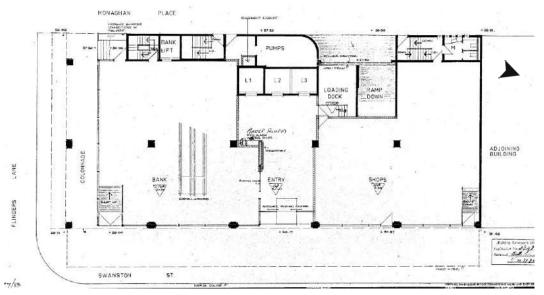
Ground floor plan. Drawing by Buchan, Laird & Buchan, dated April 1971 (BAP).
